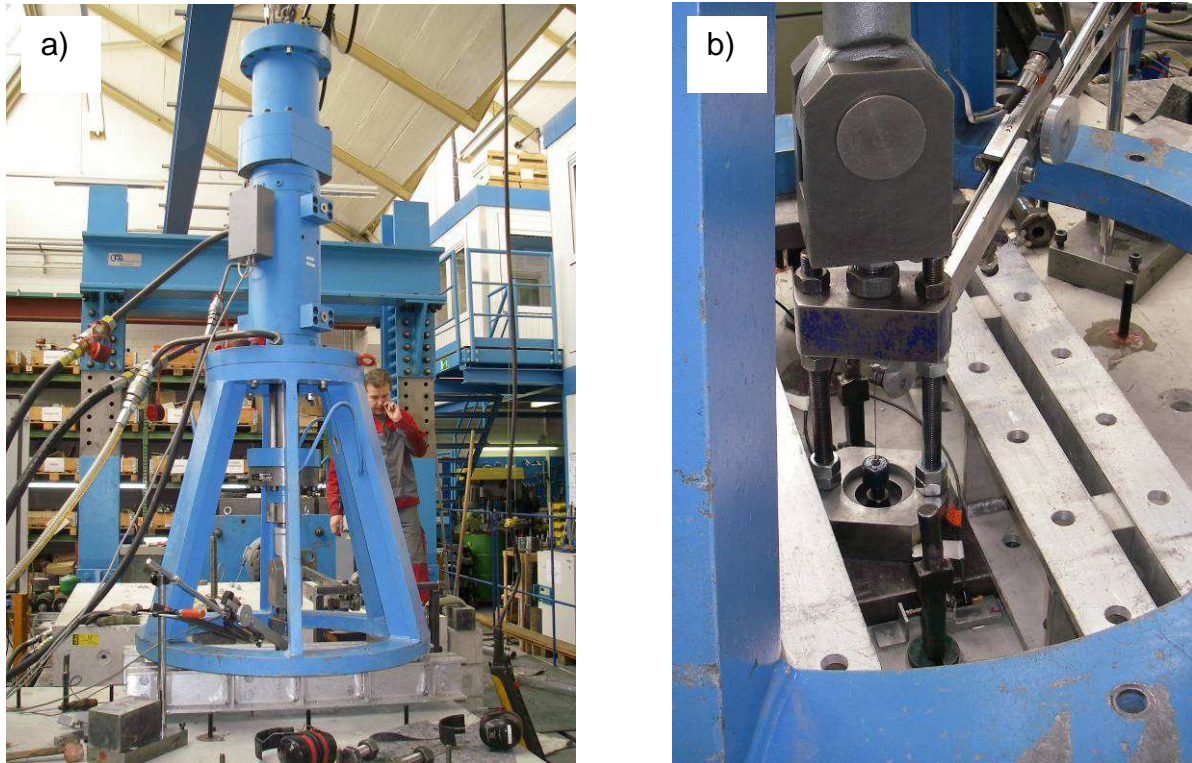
a) Actuator resting on wedge-split concrete slab; b) Close-up of installed anchor, confining steel plate, and anchor displacement and crack width transducers
